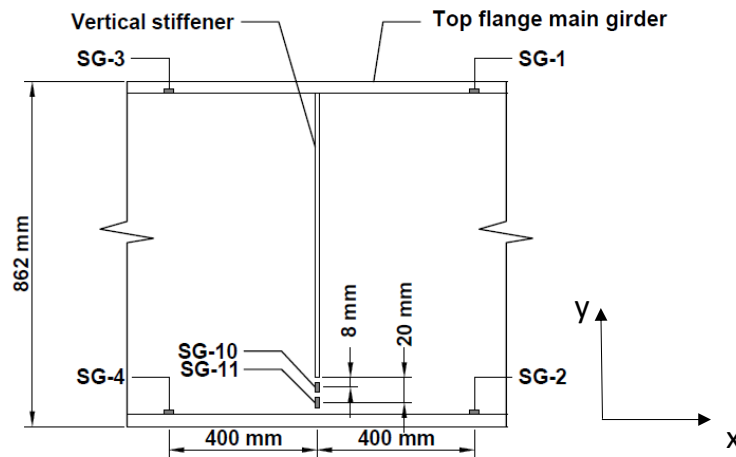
Schematic showing locations of weldable strain gauges in web gap near weld region of main girder (side view).
